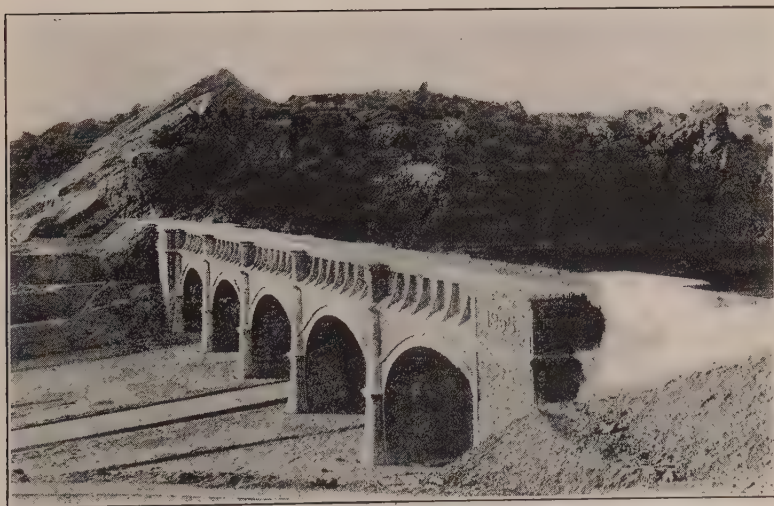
Reinforced-Concrete Aqueduct on the Main Aragon Canal.
